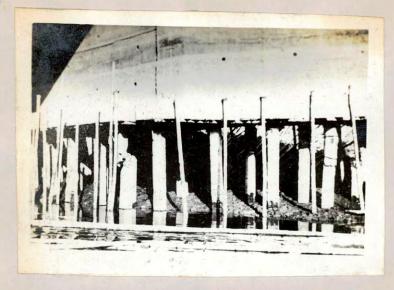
Failure by scouring and subsequent breaking of piles under the abutment
